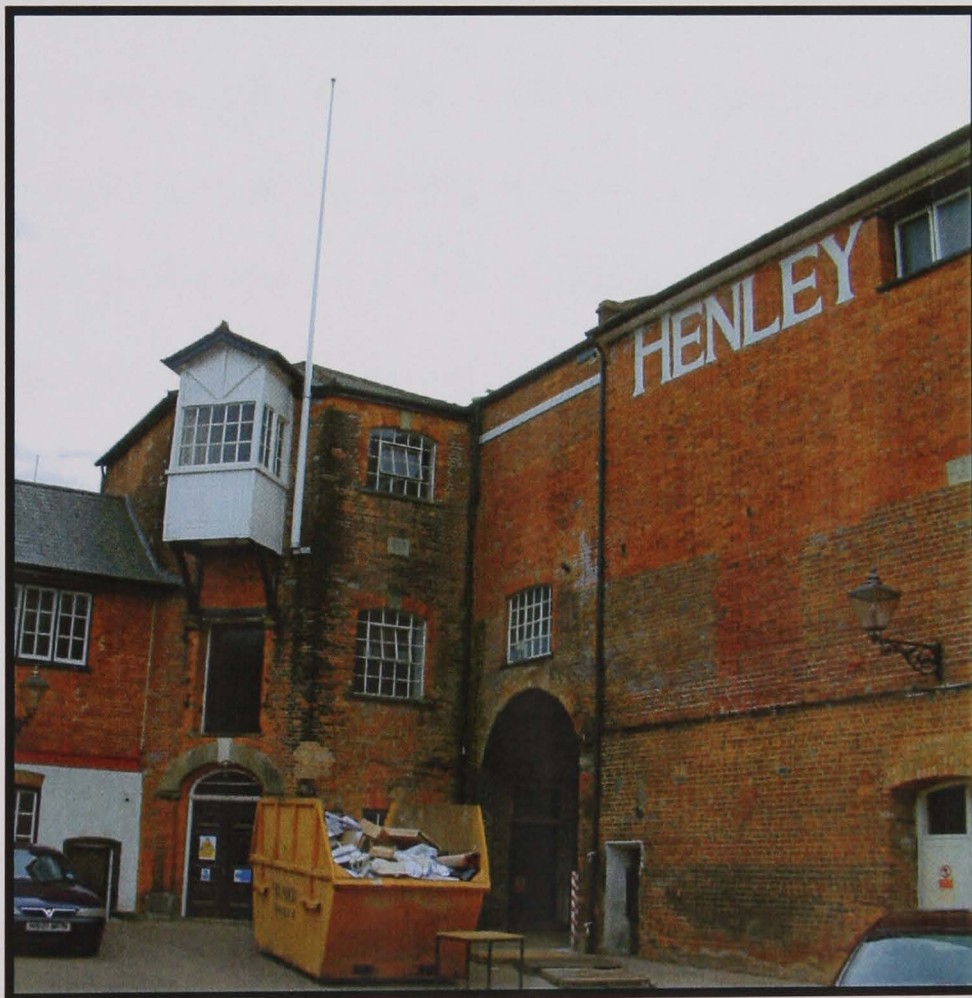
Courtyard, North and East Elevations. Source: Hotel Architect
